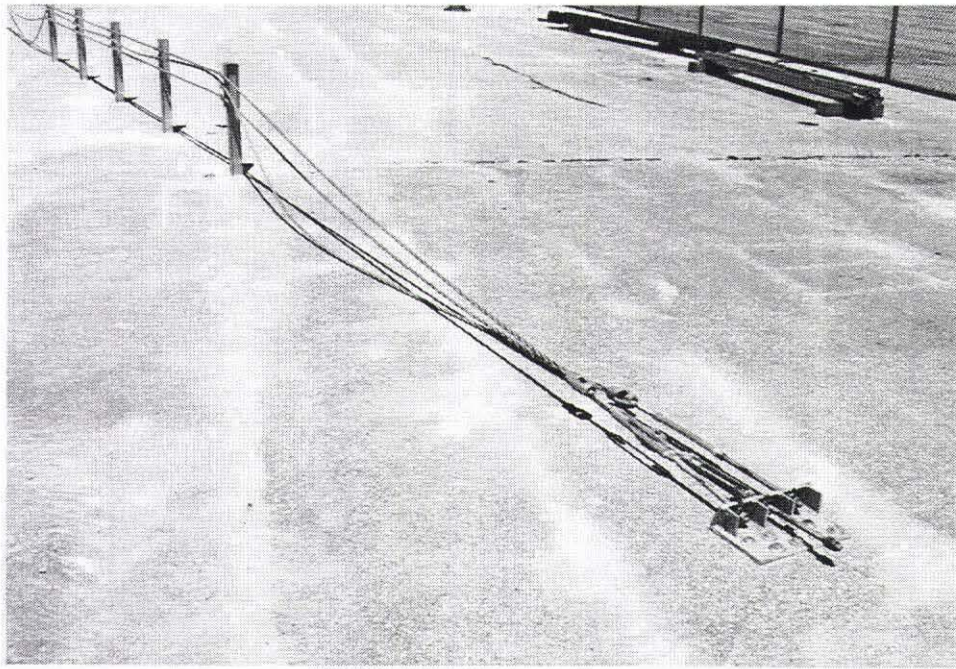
Upstream Cable Anchorage Damage, Test SDC-2
